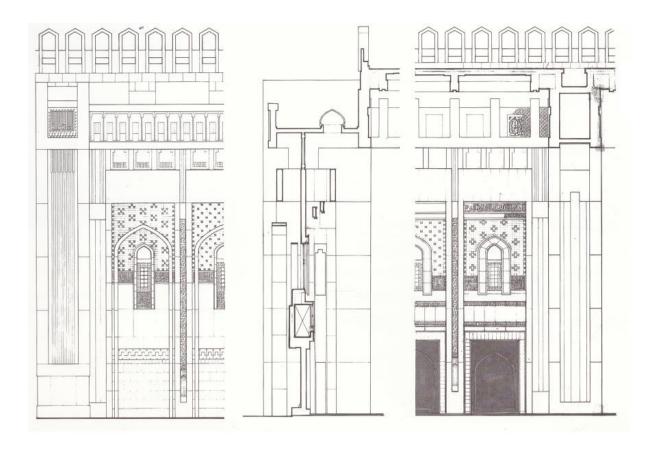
From left: exterior elevation of the wall bay unit, section of the wall bay unit and section-elevation of the interior wall bay units and decorations. Source: (Kanan, 1990, p. 67).
